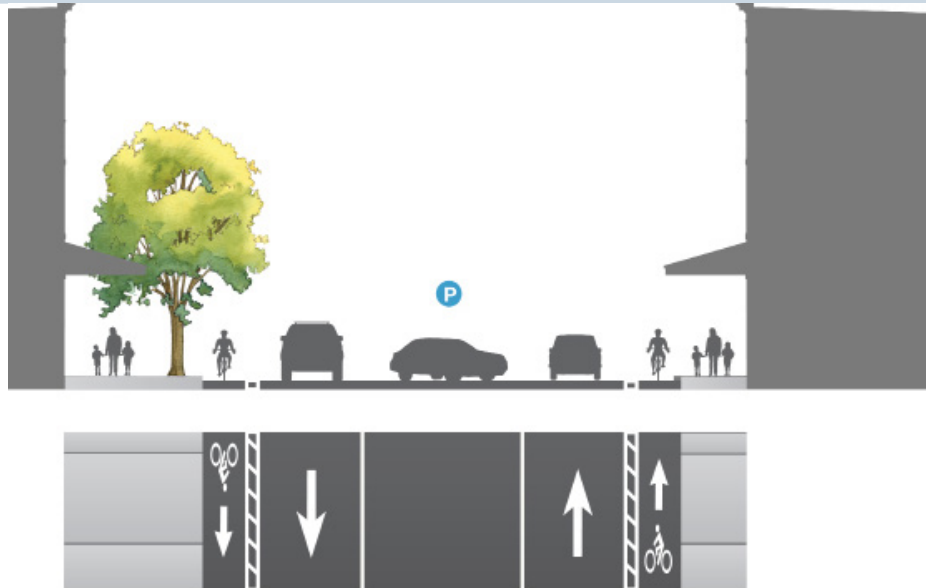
Main Street (Between A Street and B Street) Proposed Improvements - Option 2
